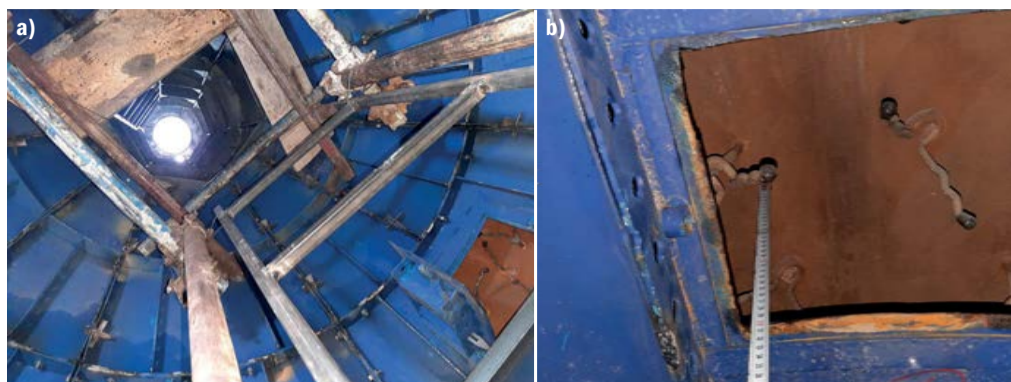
Internal forms assembled and measurement of lining thickness from pouring holes before casting.
